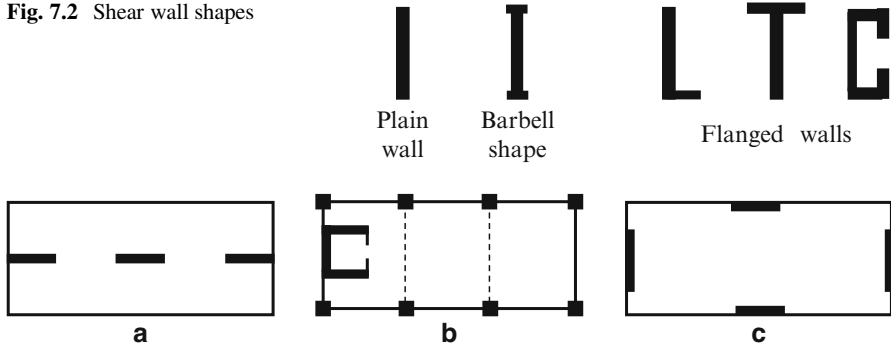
Shear wall layouts (a) Collinear walls, (b) Unsuitable layout, (c) Preferred layout
